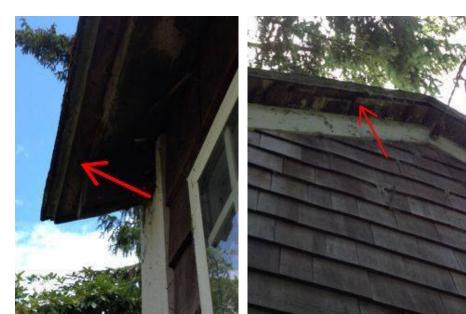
Photo 34-4A white fuzzy growth on underside of roofRot at roof sheathing.sheathing
